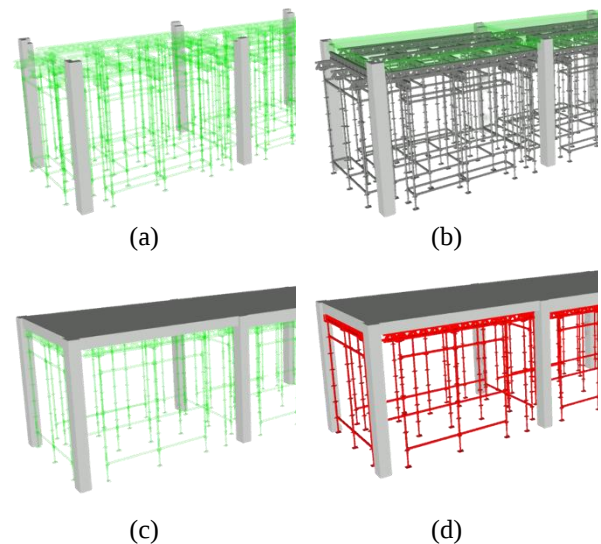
Beam and slab (a) shoring installment, (b) concrete casting, (c) reshoring, and (d) dismantling
